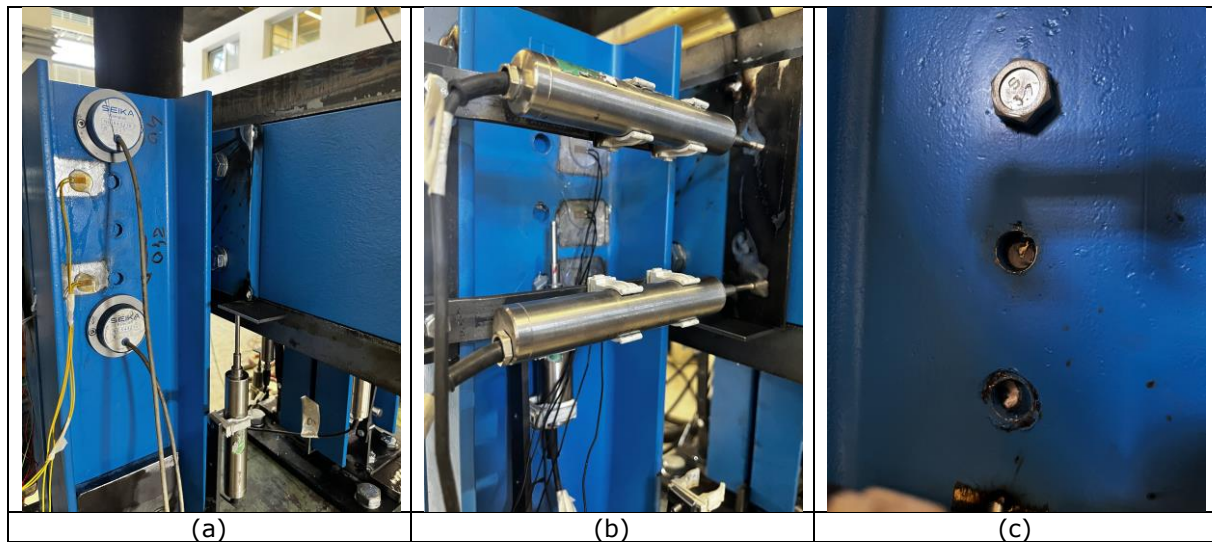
Detail 5 at failure: (a) frontal view of aluminium bolts under tension force; (b) frontal view of aluminium bolts under compression force; (c) movement between UPN160 elements and T plate elements after cyclic test.
